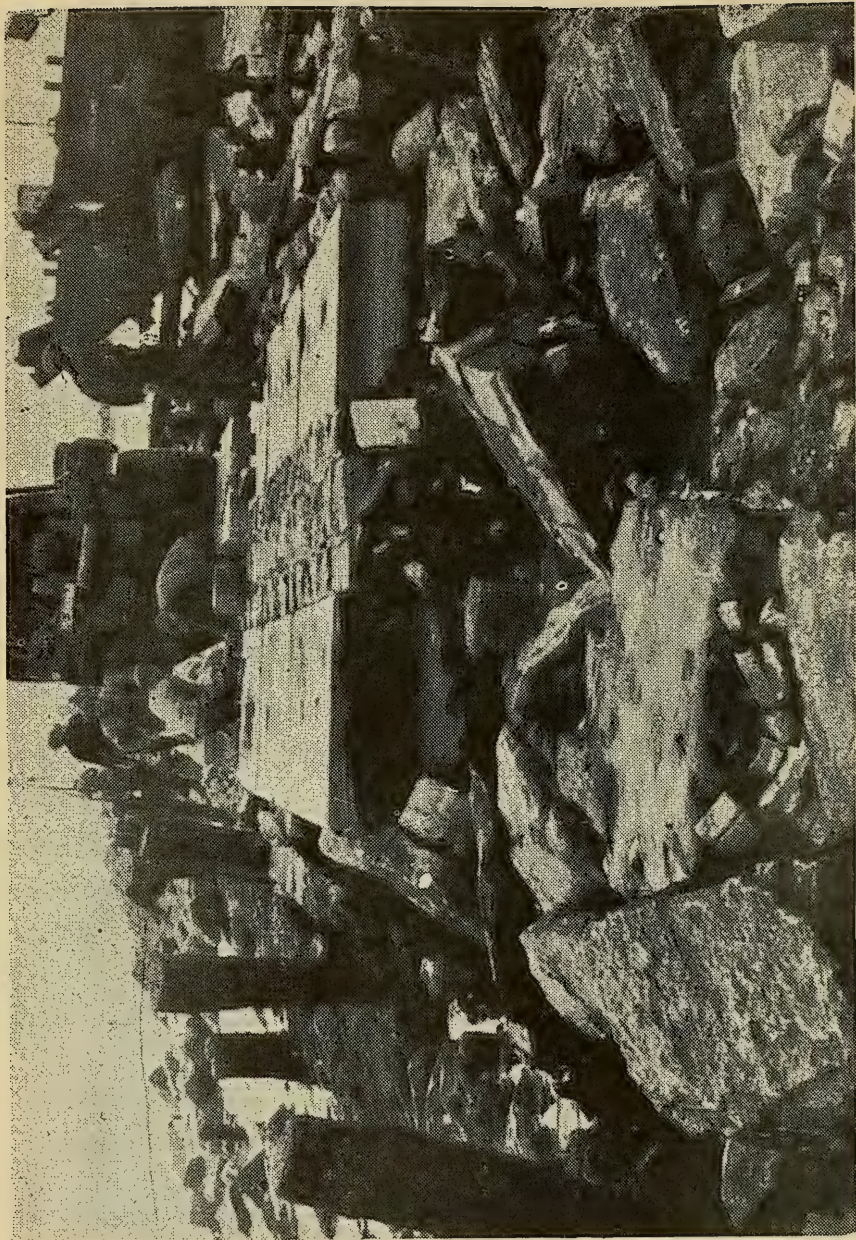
Connecting dam near south pier at Hook of Holland. Damage caused by gale in April 1949 on a short section which was almost completed, but where the sides of the track had not yet been grouted.
